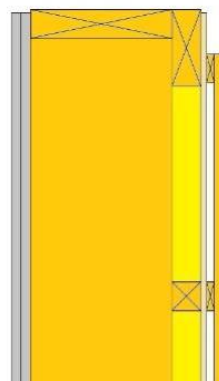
Standard facade wall construction used by Lindbäcks Bygg AB, here with wooden panel.
